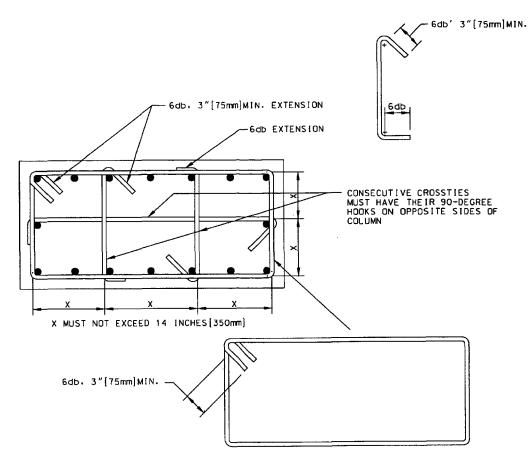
Typical seismic resistant details: transverse reinforcement in columns.
